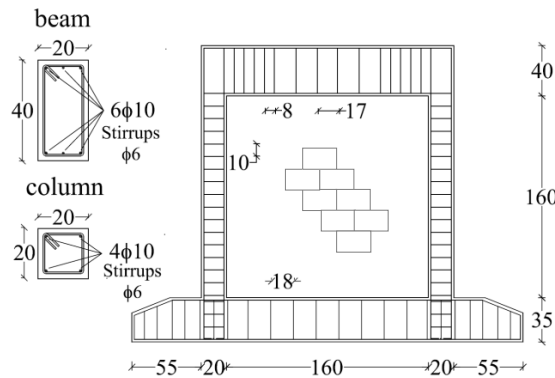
Hollow brick masonry infilled frame specimens details (Cavaleri et. al., 2012 [23]).
